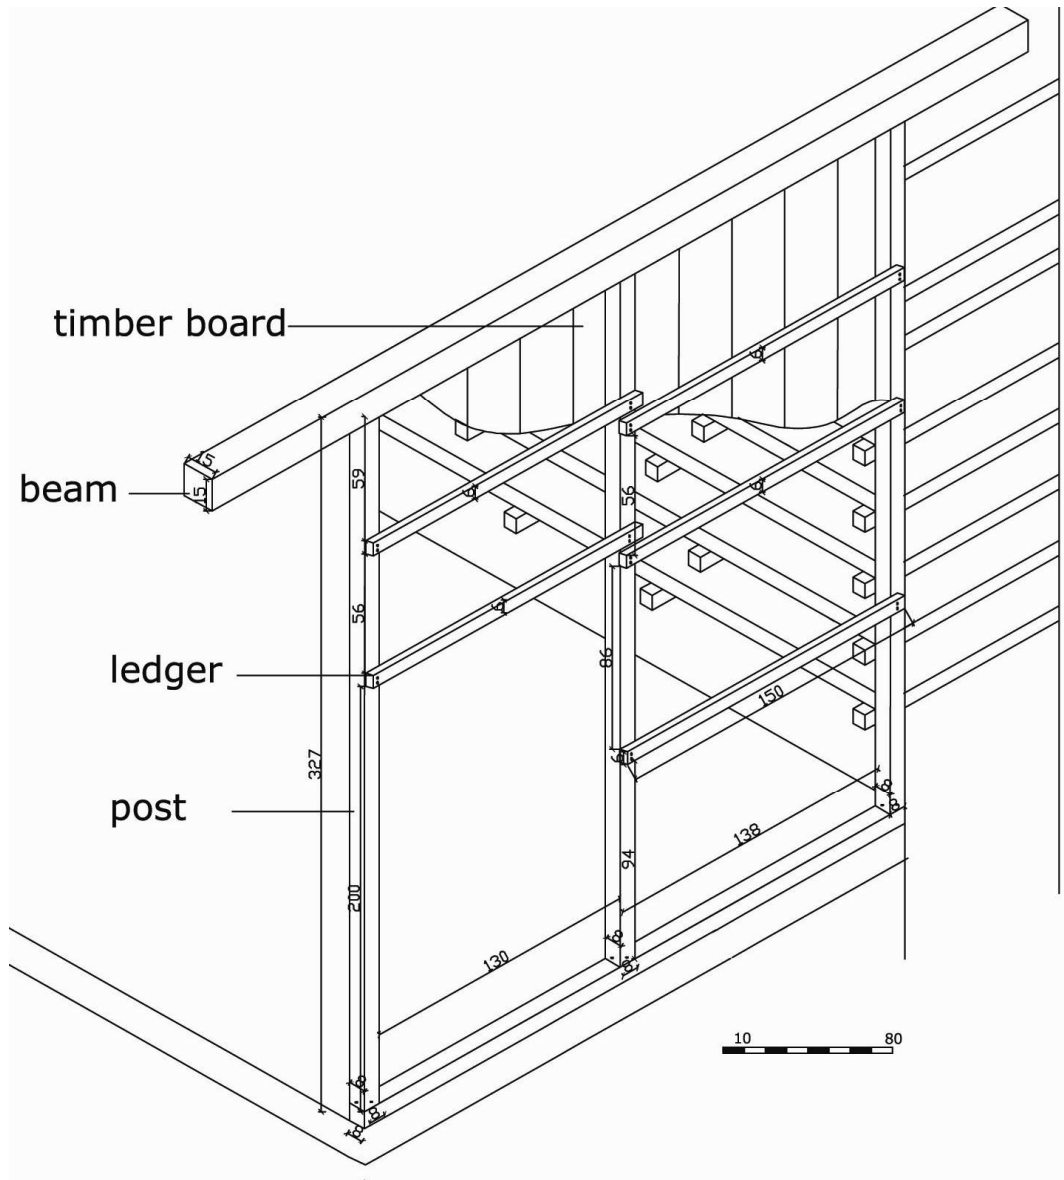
17 Drawing of the timber wall type 1. Çelik 2008.
